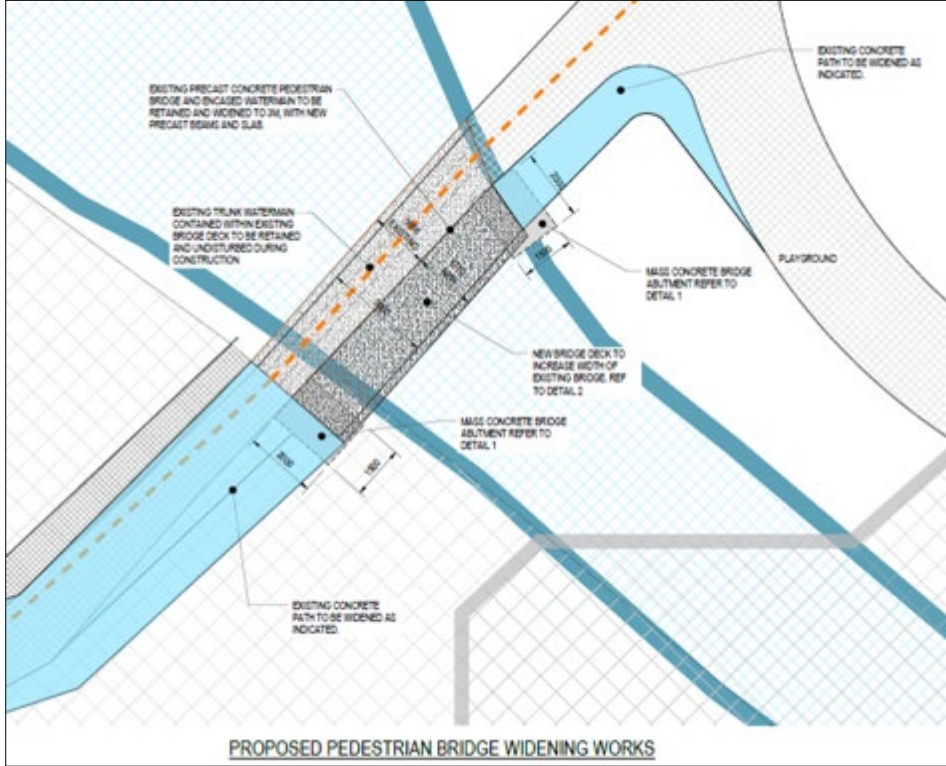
Proposed pedestrian bridge widening work | Extract from Horgan Lynch Drawing CQ15-024
